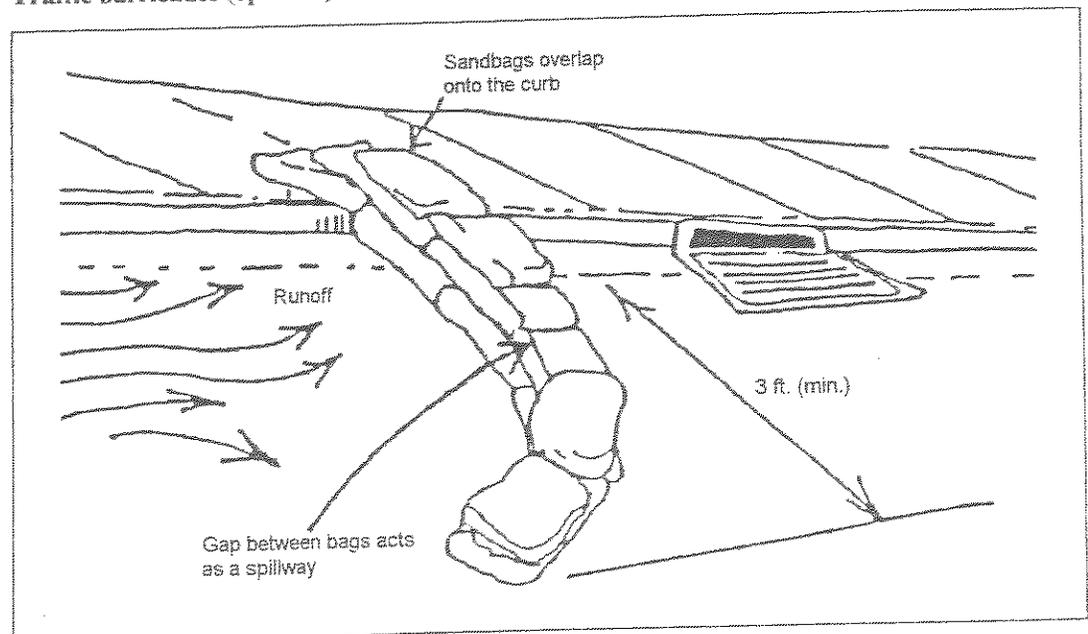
B. Detail of a sandbag curb sediment barrier to protect a curb inlet.
